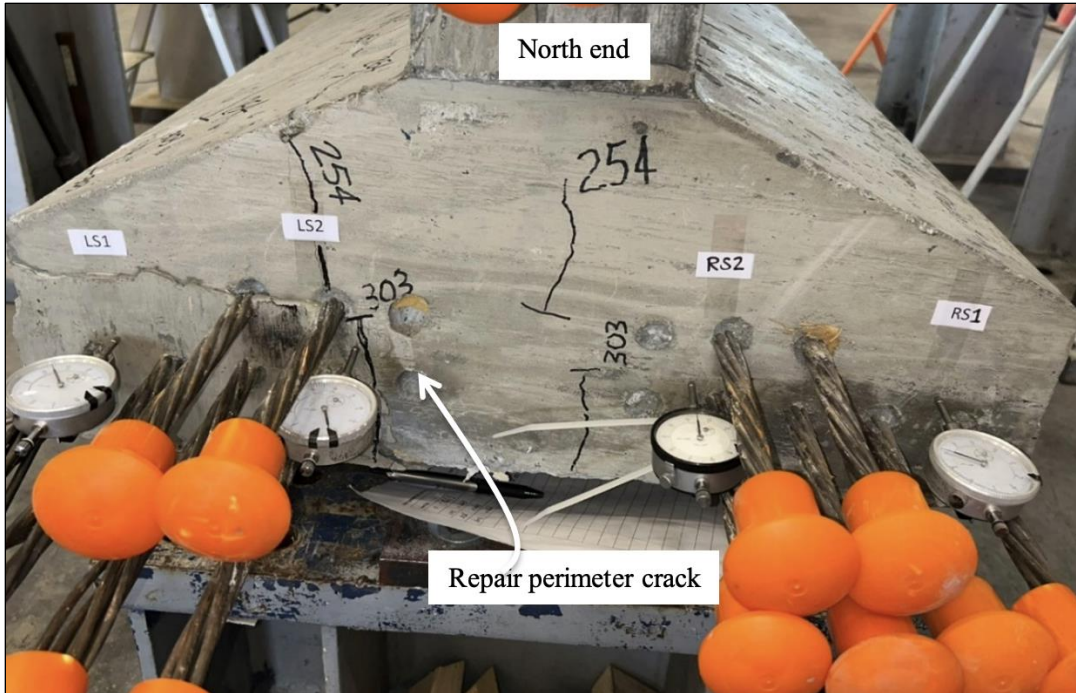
Photo. Test 1.1.S (repair 1.1LBZ) north end cross-section cracks. Note that the crack through label LS2 for the slip dial gauge goes through and around the prestressing strands adjacent to the web. The repair is on the bottom left side of this end view.
